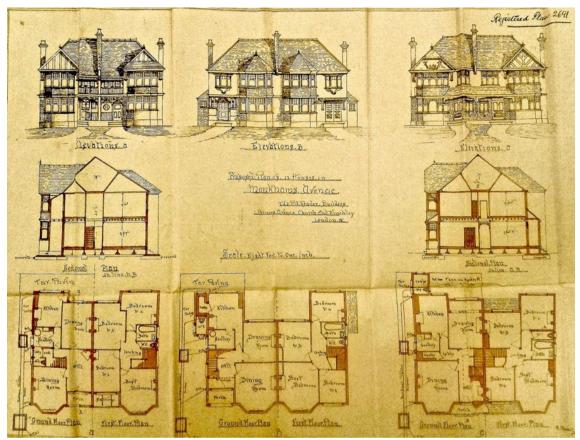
Building application plans for 12 houses in Monkhams Avenue, designed by R. Reader, 1909 (Woodford Urban District Council, 'Notice of Intention to Erect New Building', No. 2691, 1909, Redbridge Local History Archive)
